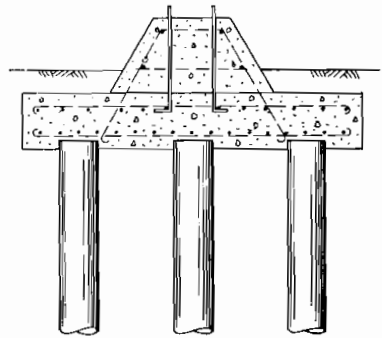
Base pier of reinforced concrete on piles for use in poor soils.
